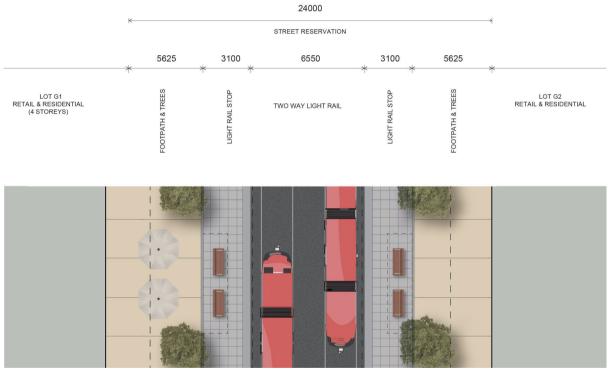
Typical street section 1 - Factory Street
